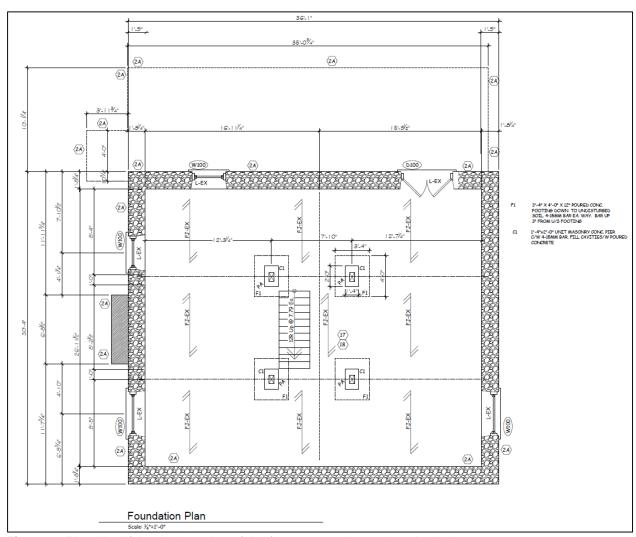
Plan identifying the location of the four proposed new piers in the basement.
